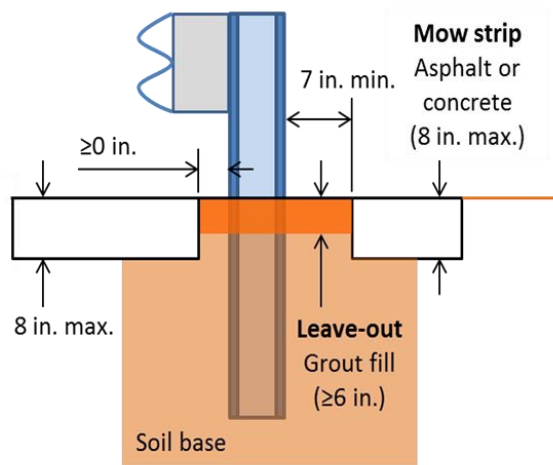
Typical guardrail post installed in an asphalt mow strip [2].
